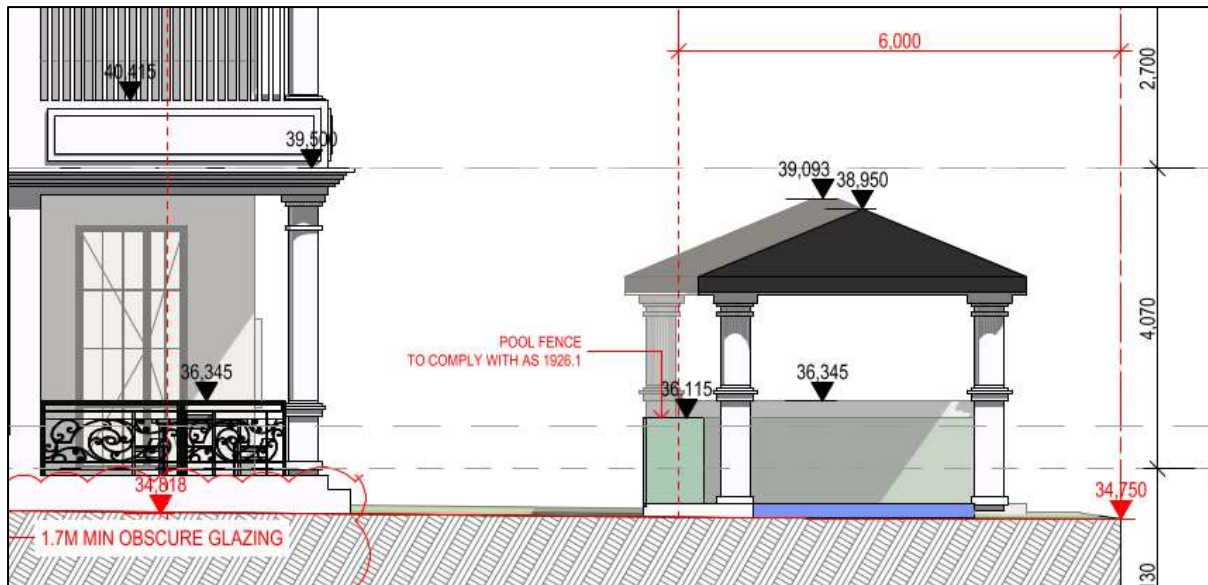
Proposed cabana structure and adjoining roof structure (cabana is to a height of RL39,093 AHD and roof structure extending across pool is to a height of RL38,950 AHD),
